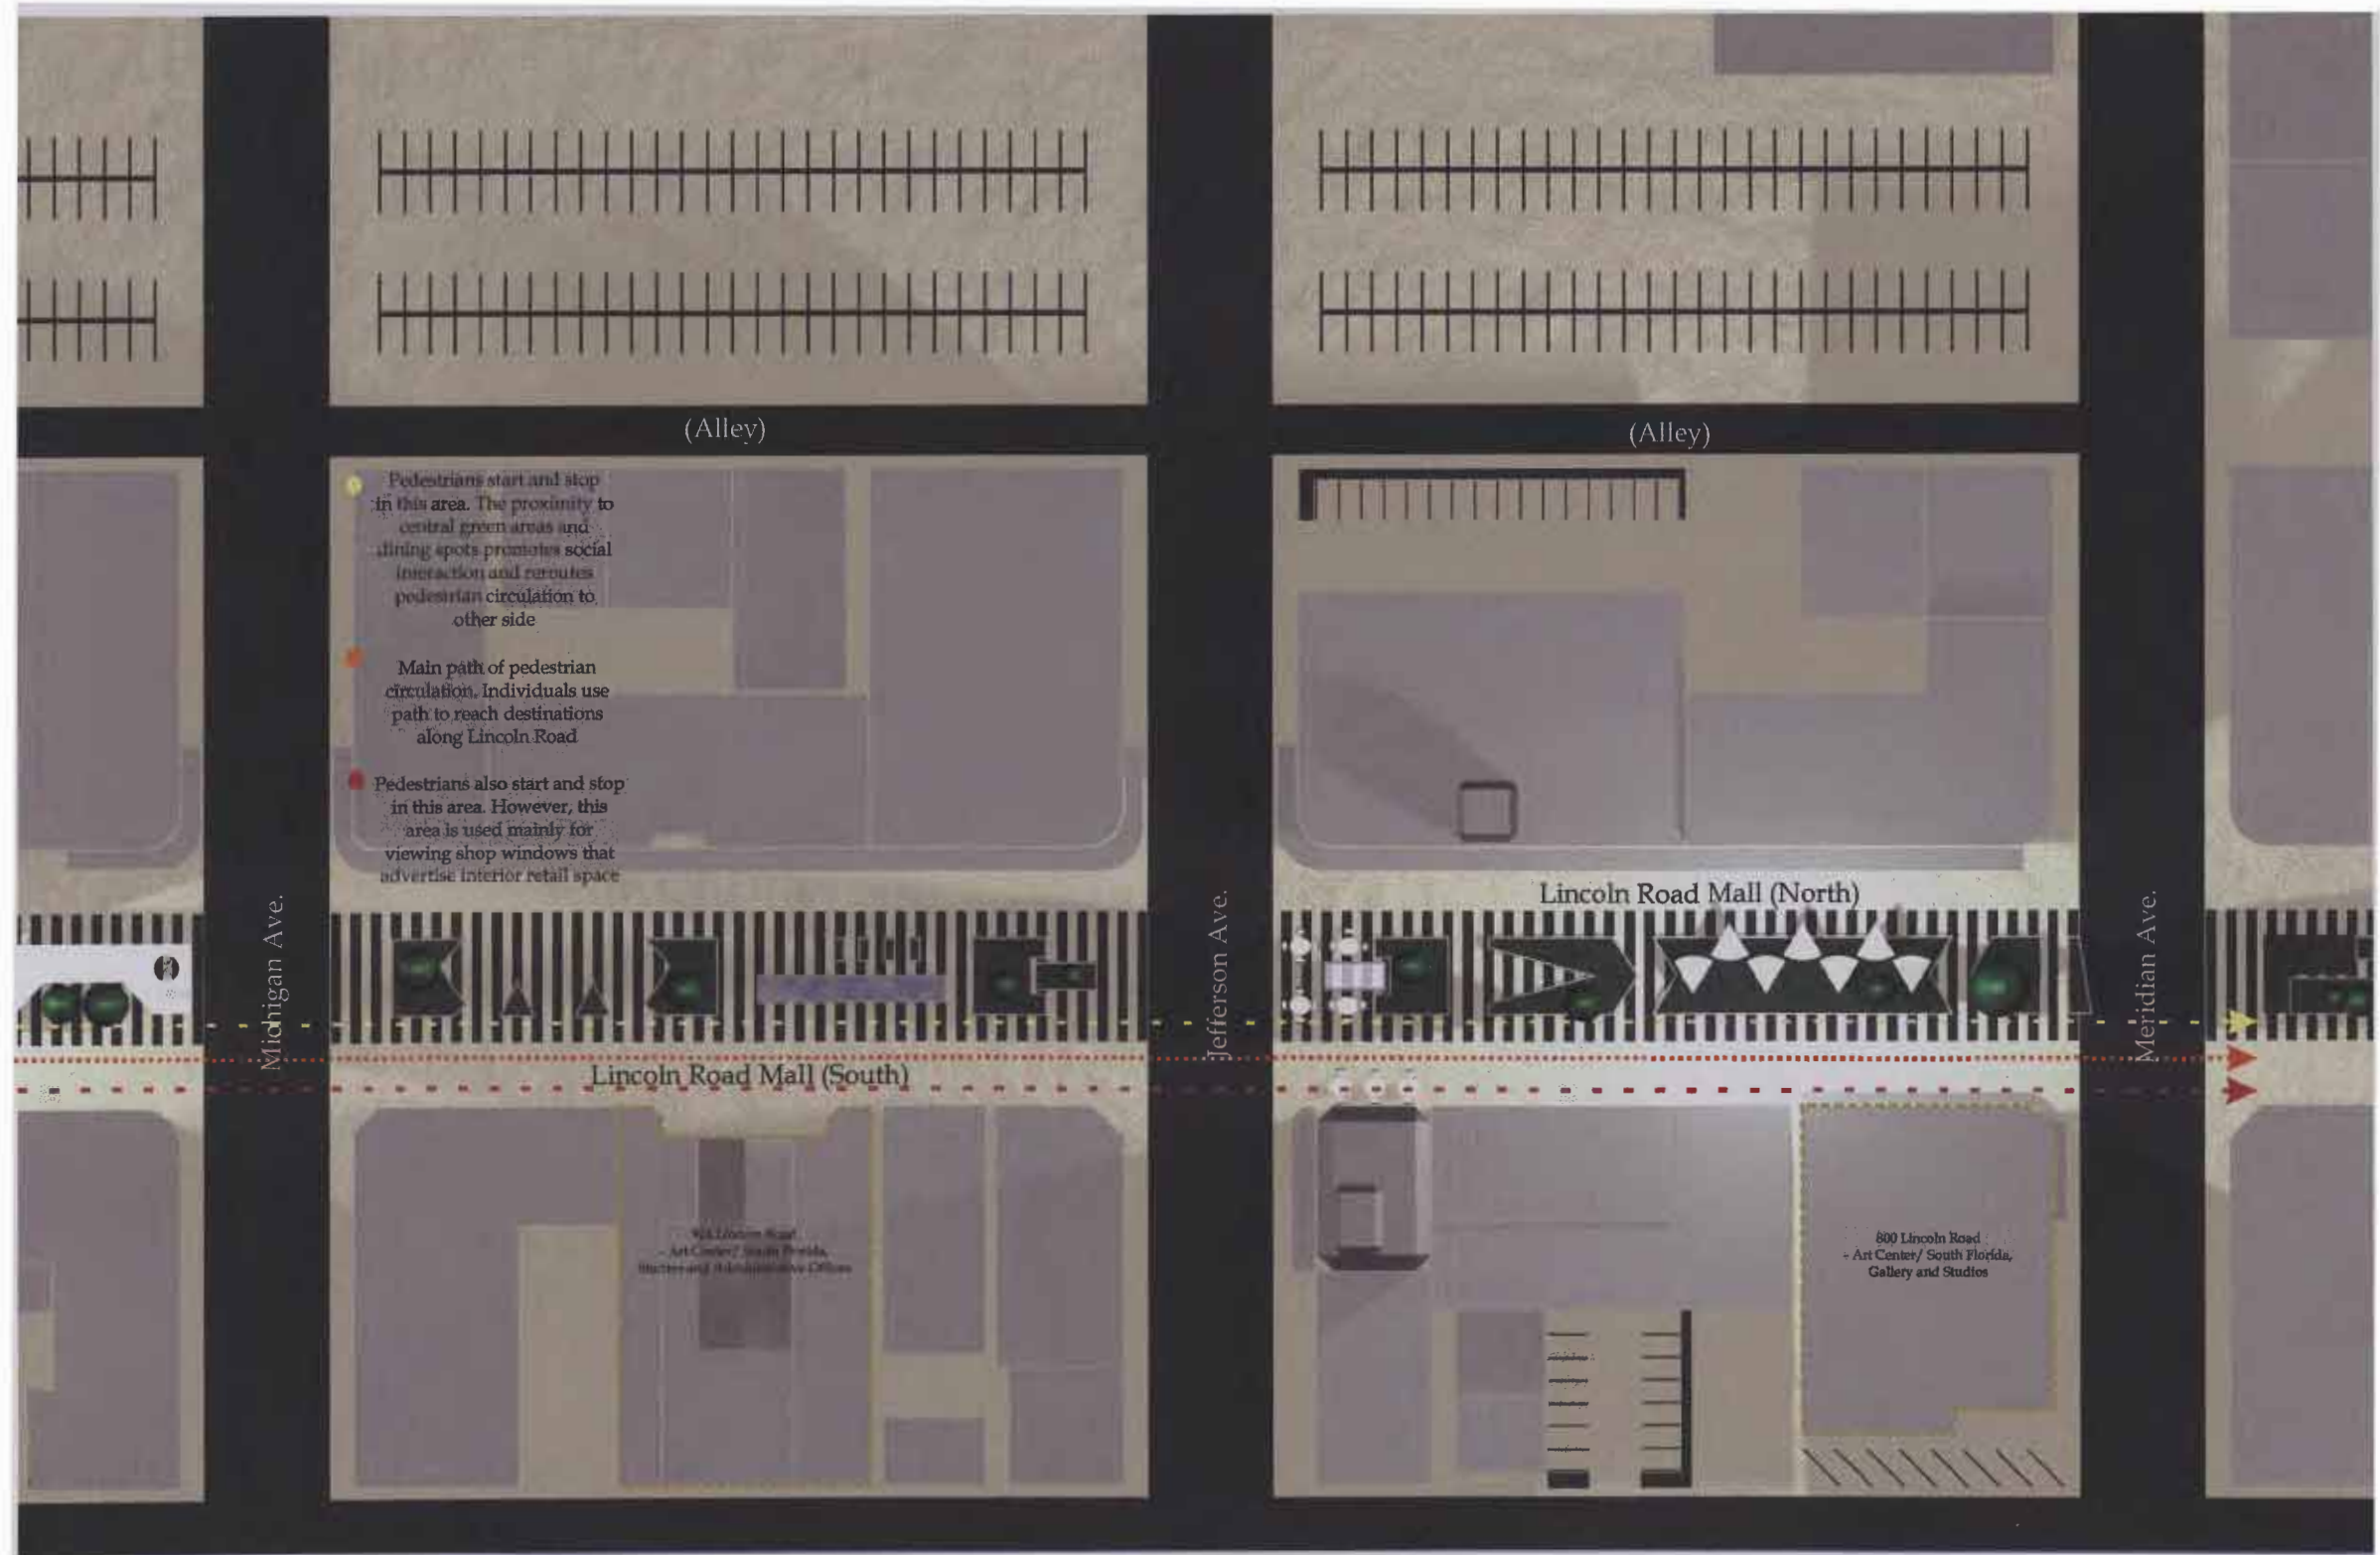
Site Detail, Existing Gallery Space, and Pedestrian Patterns
